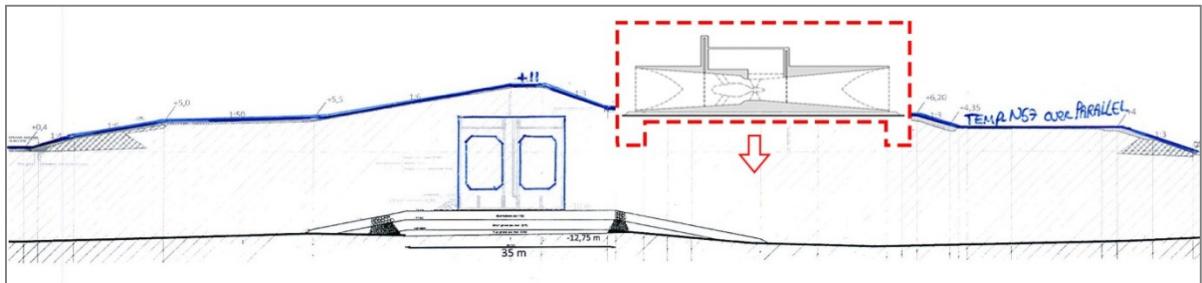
Variant 1C 'Pneumatic caisson' cross-section during construction
